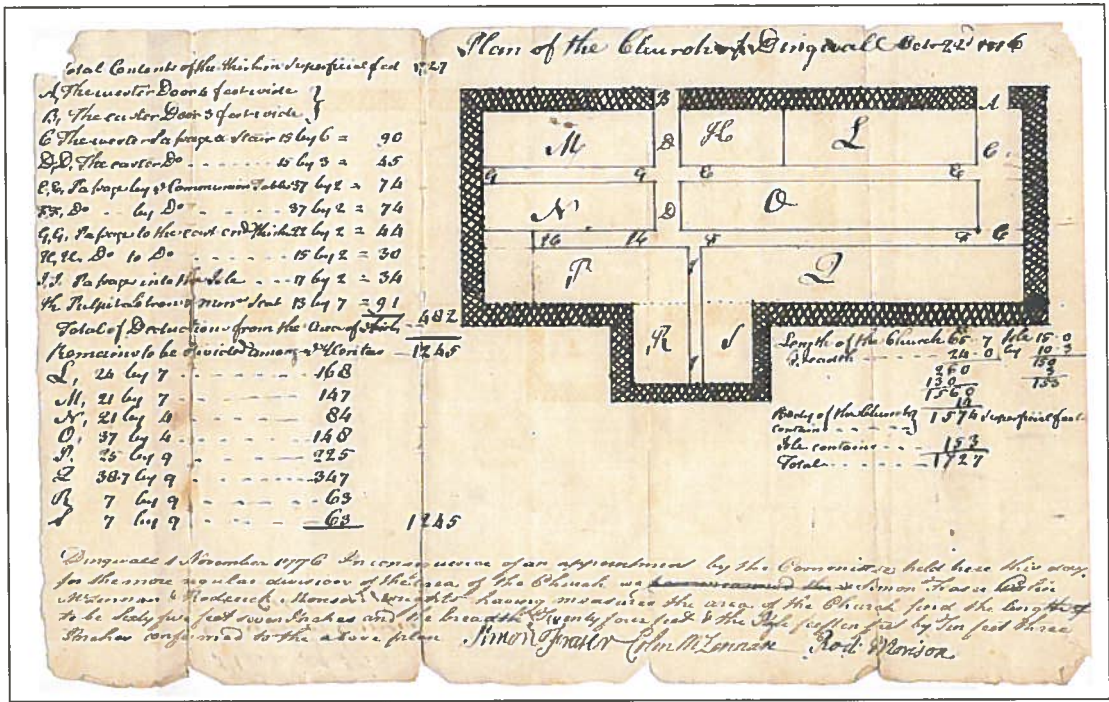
Plan of St Clement's Old Parish Church, Dingwall 1776 (north aligned to base).
